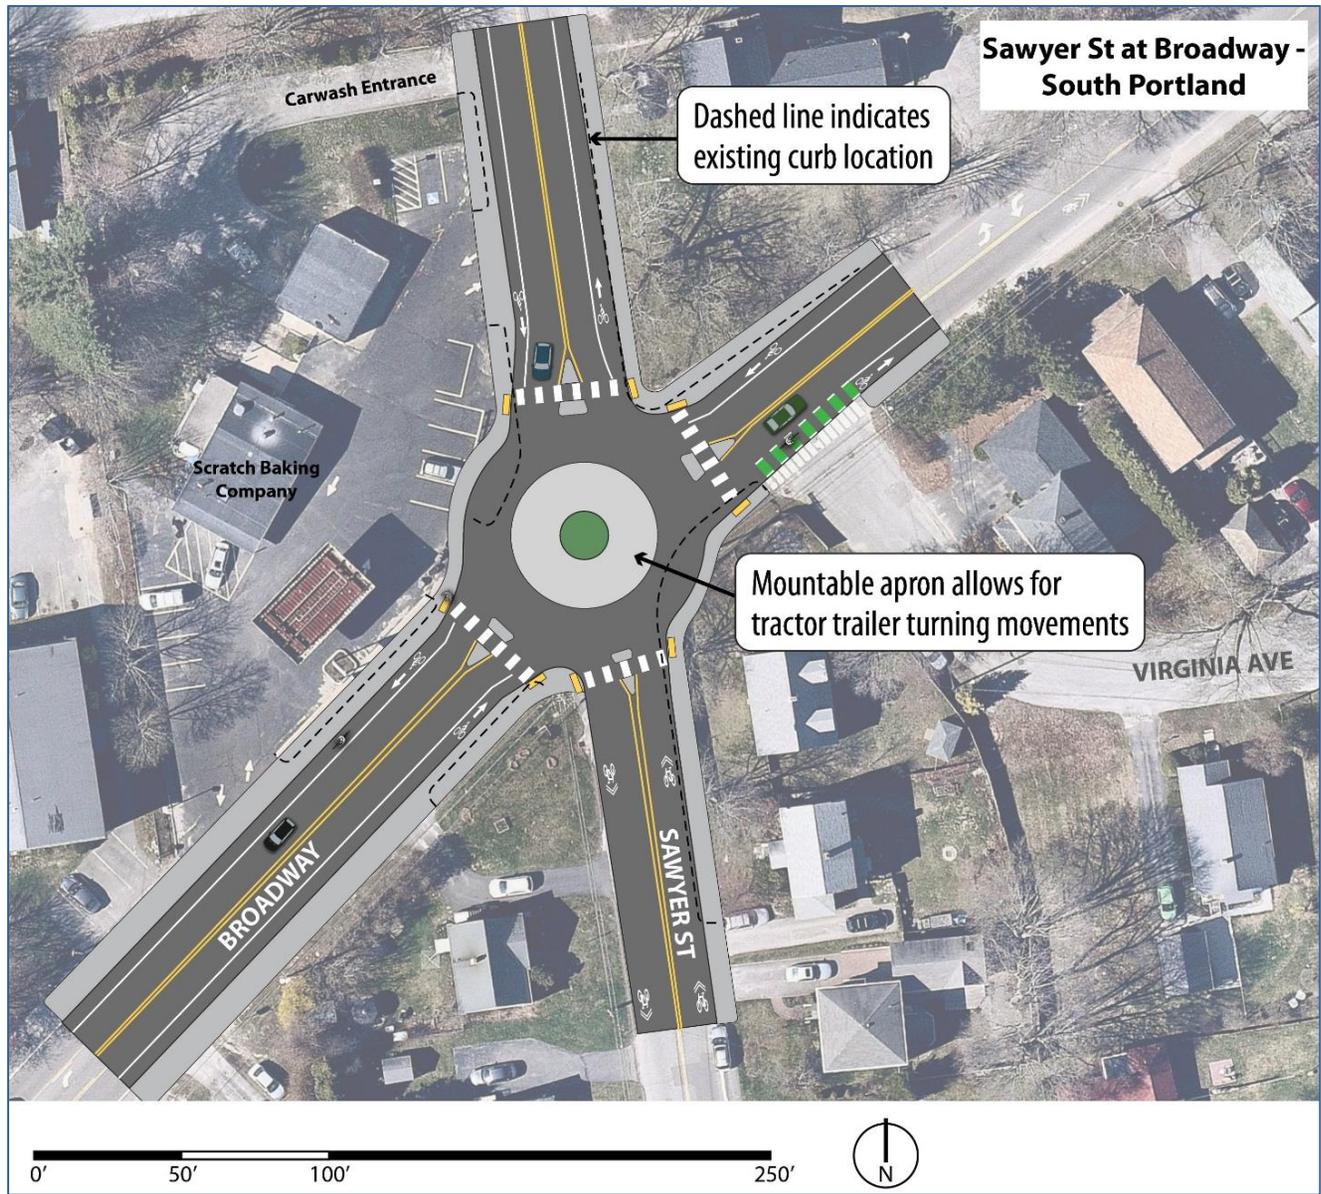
Broadway at Sawyer Street — Modern Roundabout
